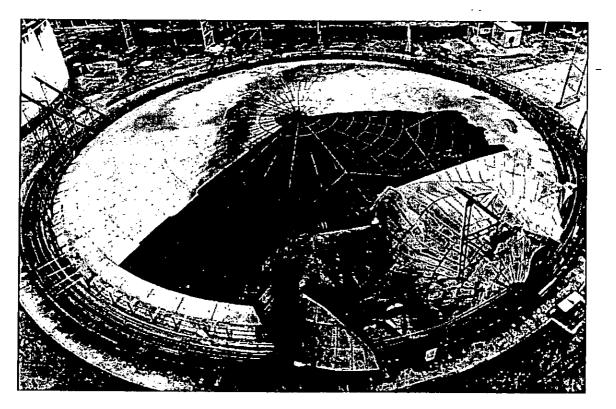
Warrington Gas Works (Roof Failure)
